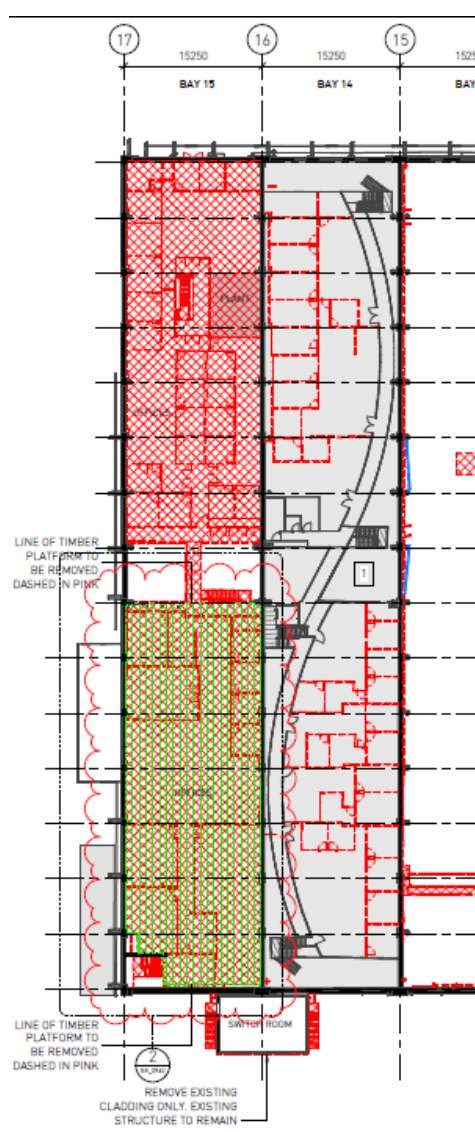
Proposed Demolition Plan – First Floor (SA-AR-DWG-BB-B4-0211 Rev T)
